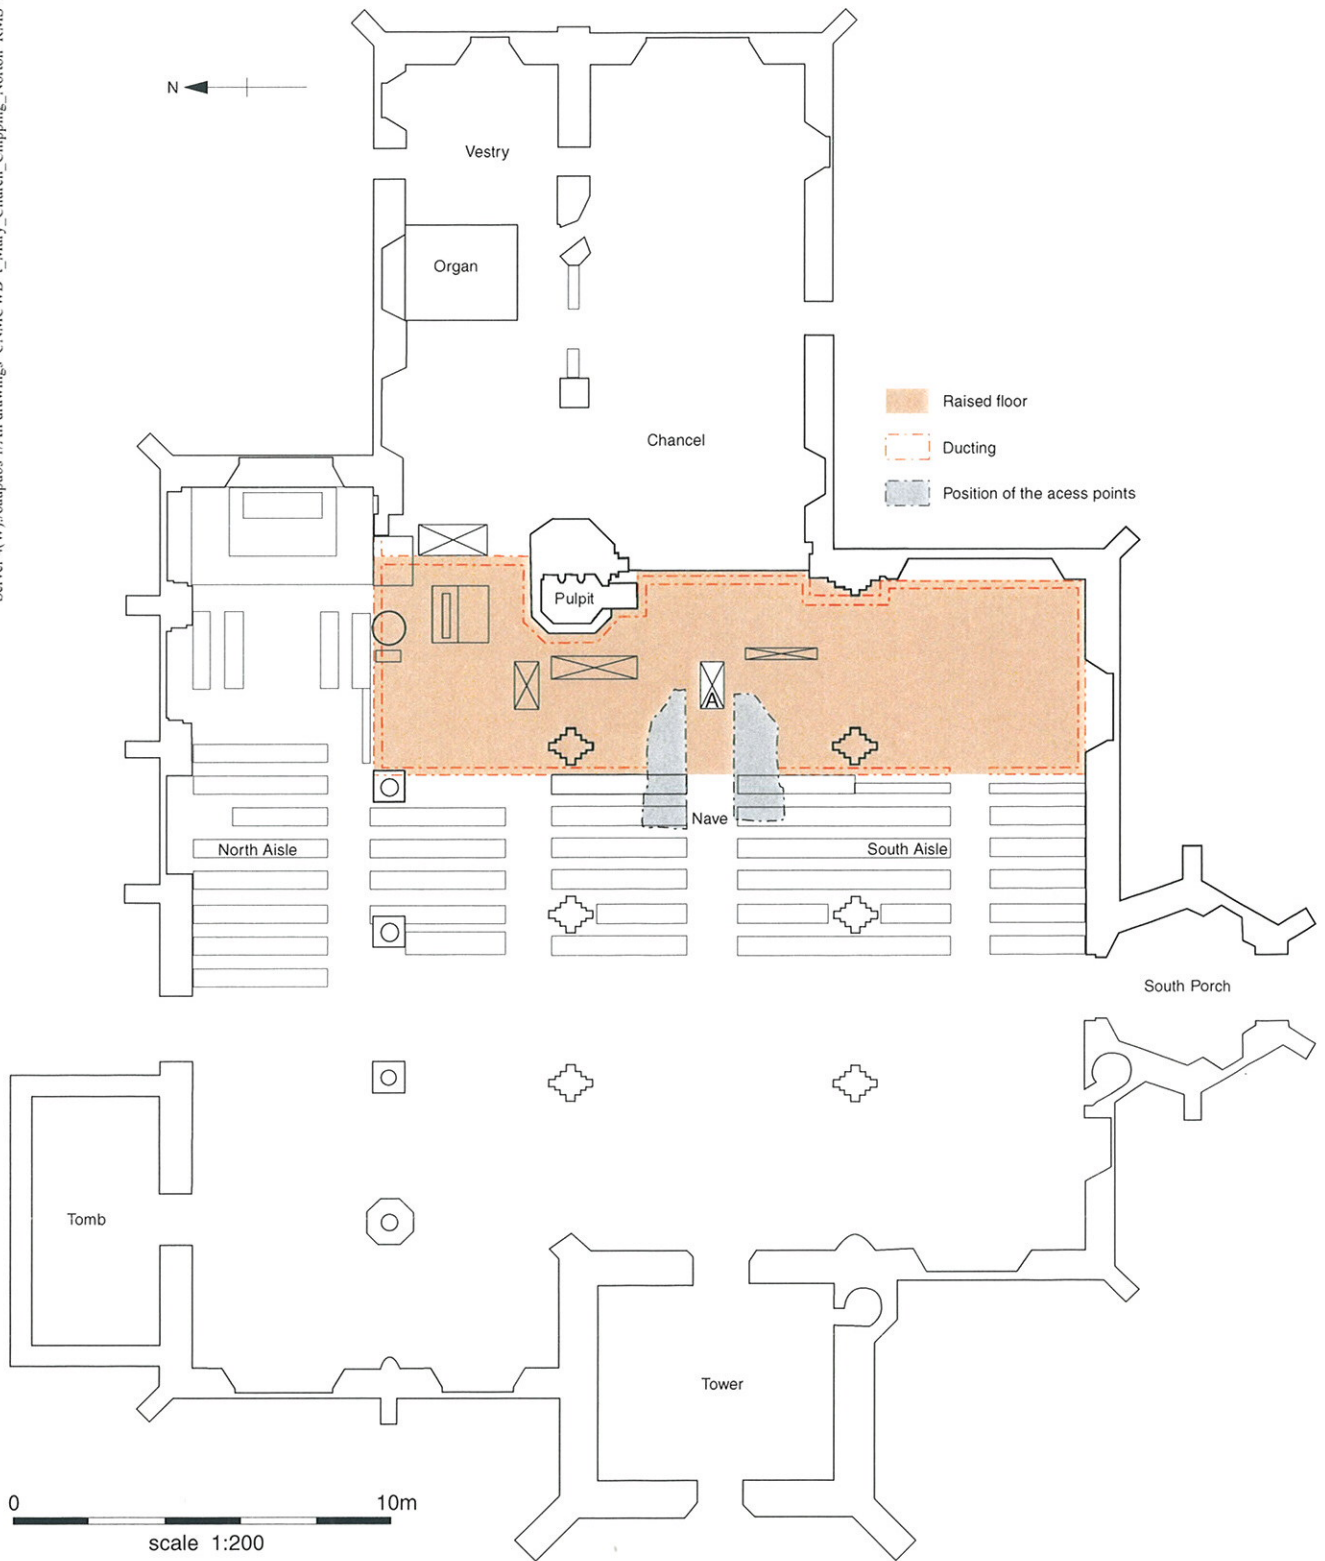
Plan Showing Area of New Raised Floor and New Service Trench
